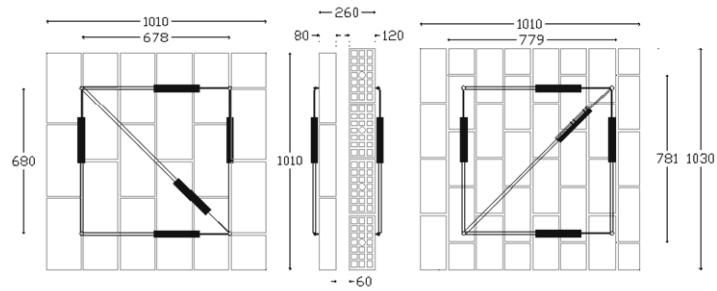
double panel walls layout of sensors on the wall compressed orthogonally to holes [mm]
